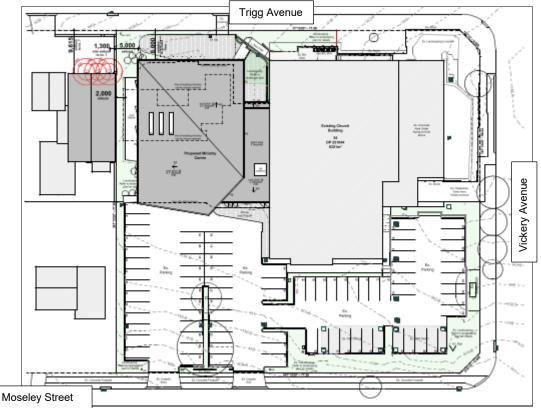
Site Plan. Source: Stanton Dahl Architects.
